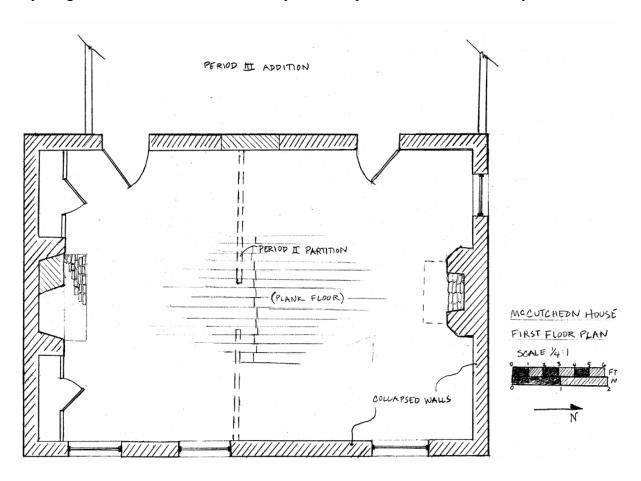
Conjectured First Floor Plan, Peter McCutcheon House.
